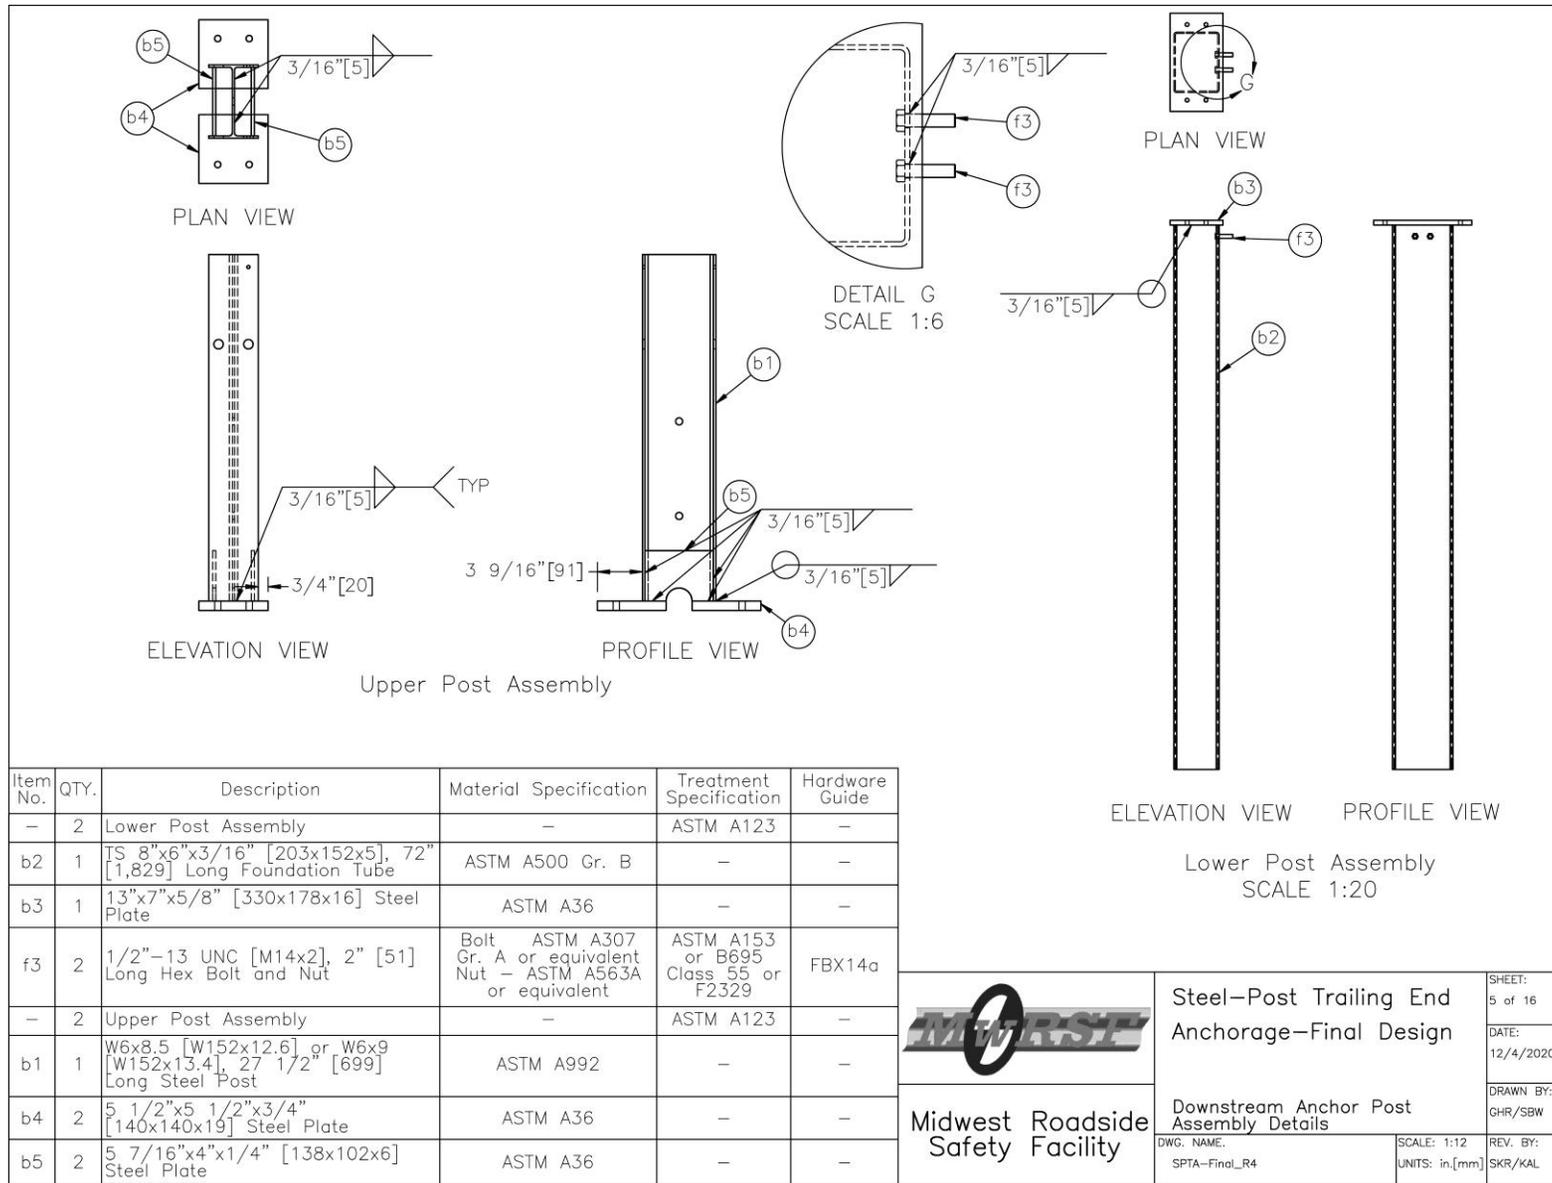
Steel-Post Trailing End Anchorage, Downstream Anchor Post Assembly Details
